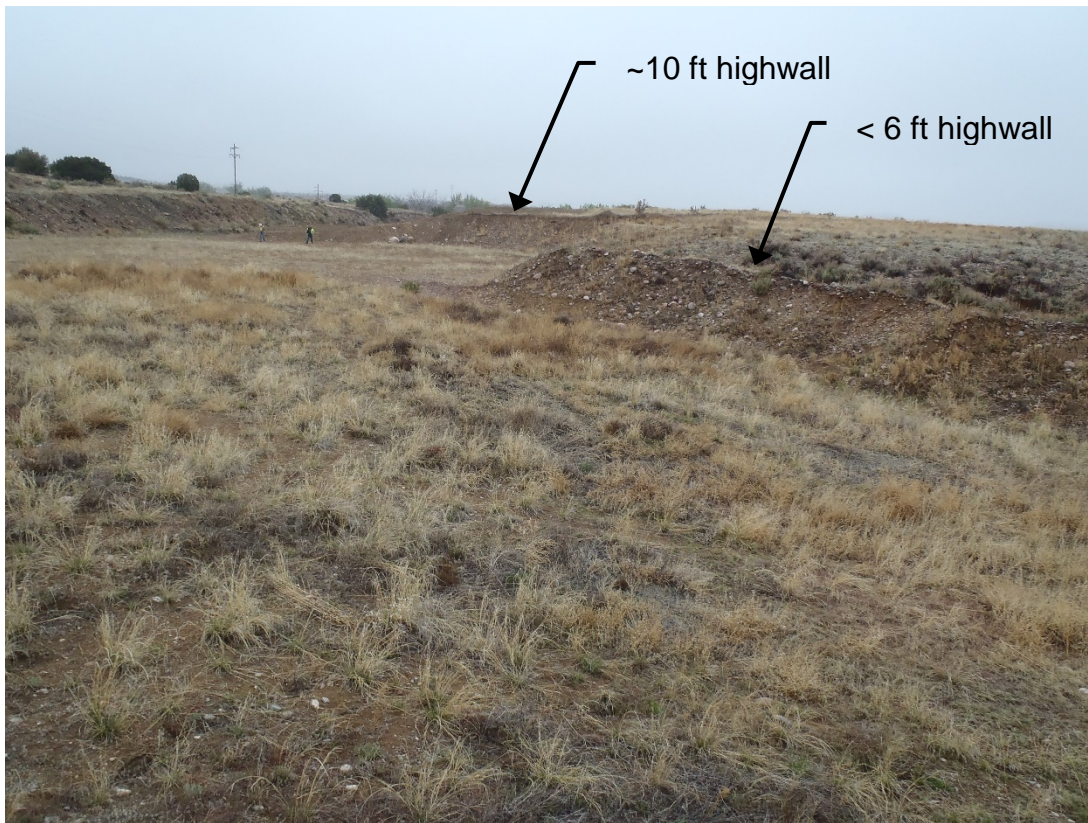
Larger footprint floor of south end "highwalls" (looking NW).
